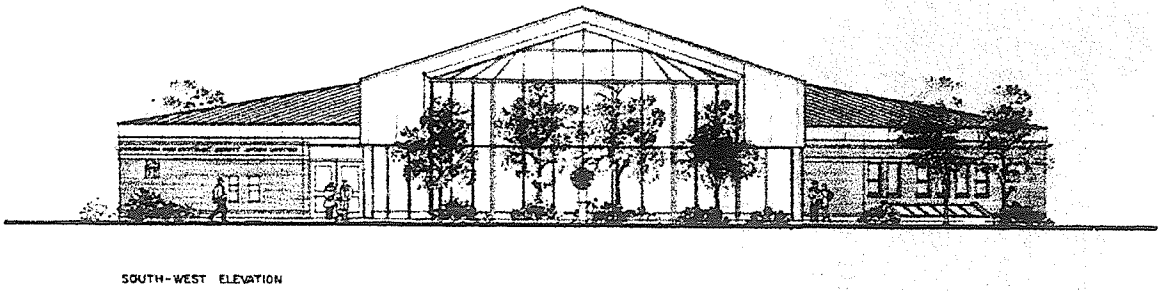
Architect design drawing, Southwest Elevation. Courtesy of the architect.
